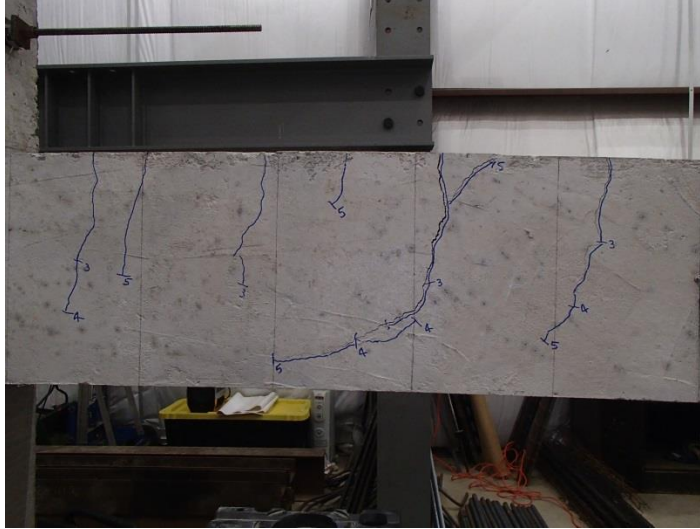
Diagonal tension cracks near the south column (Specimen 1)
